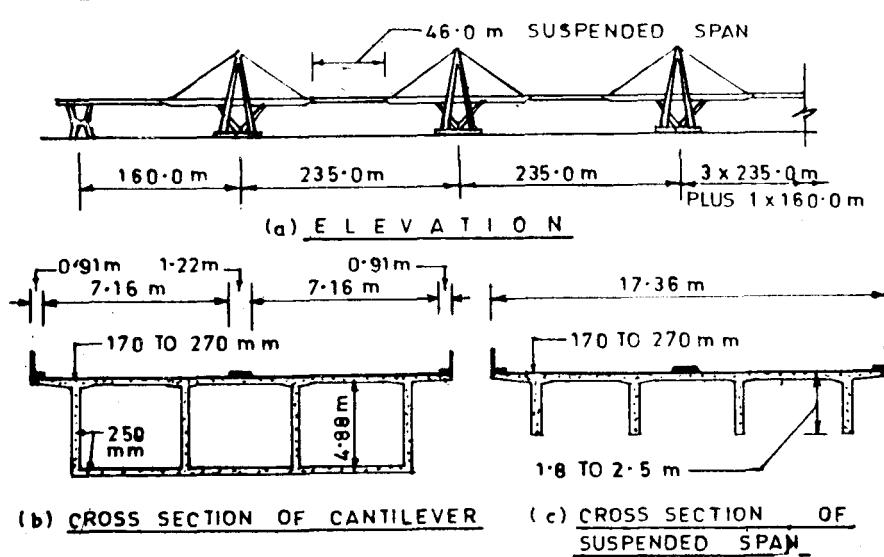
·16 MARACAIBO BRIDGE (VENEZUELA)
